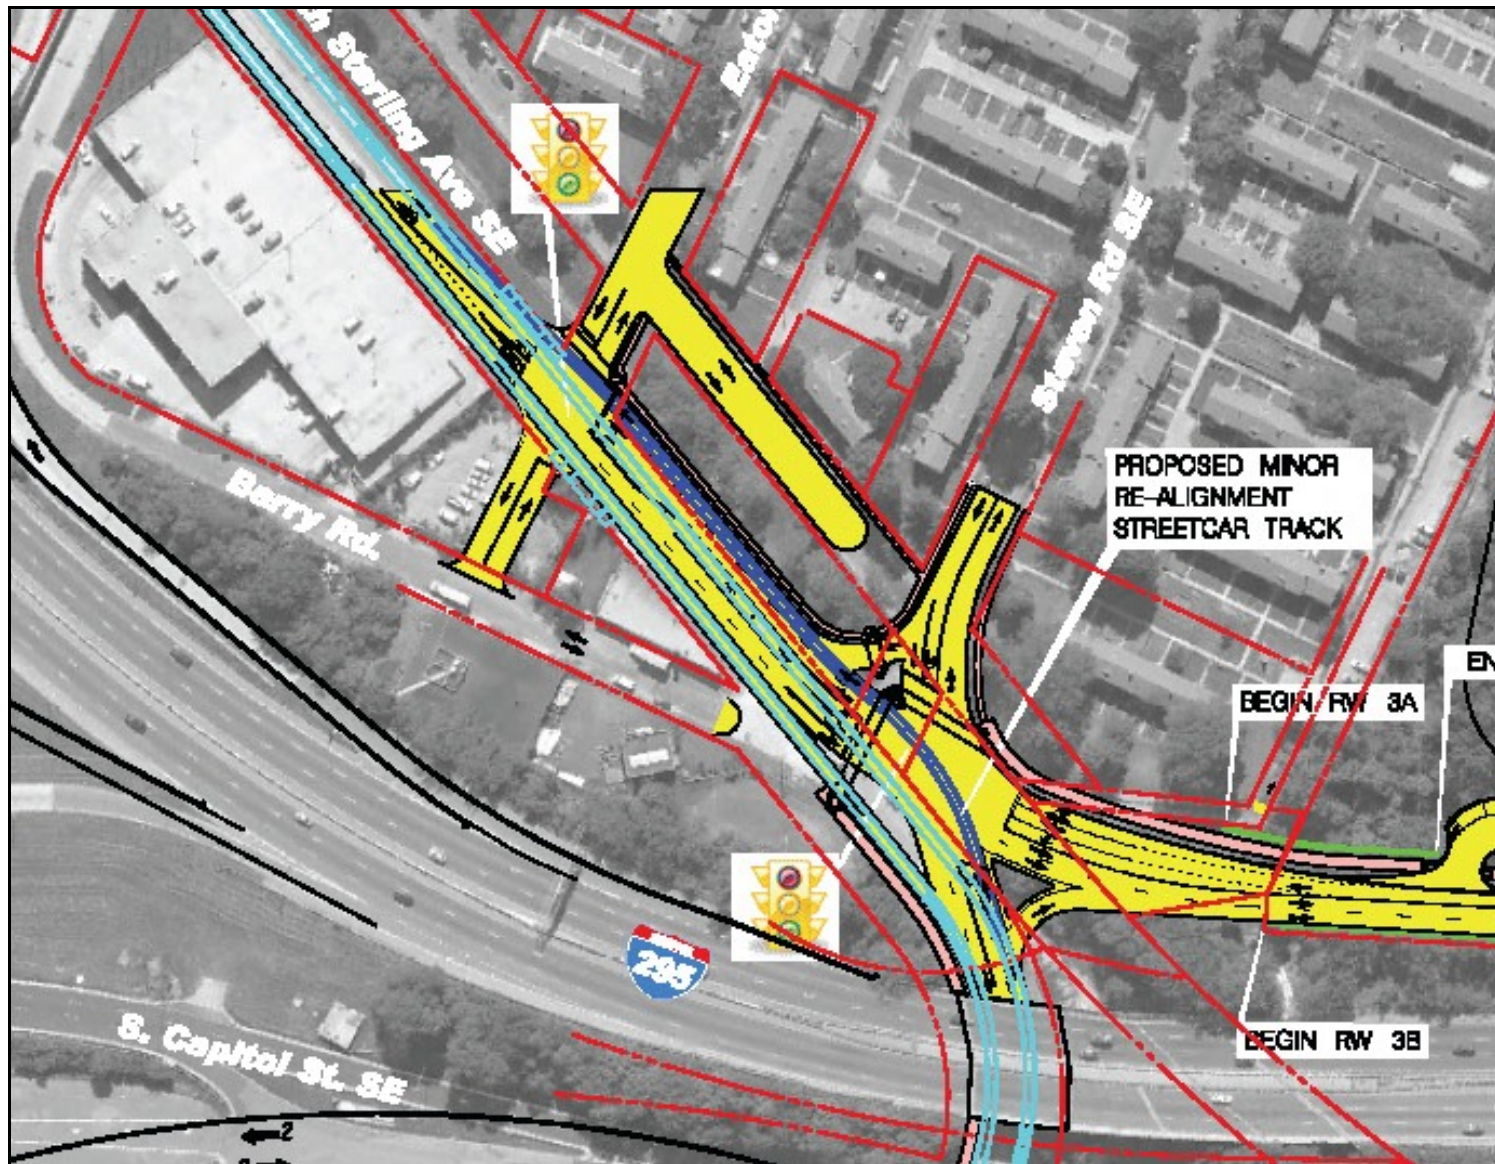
West Campus Access Road Parallel Bus Bay Alternative
